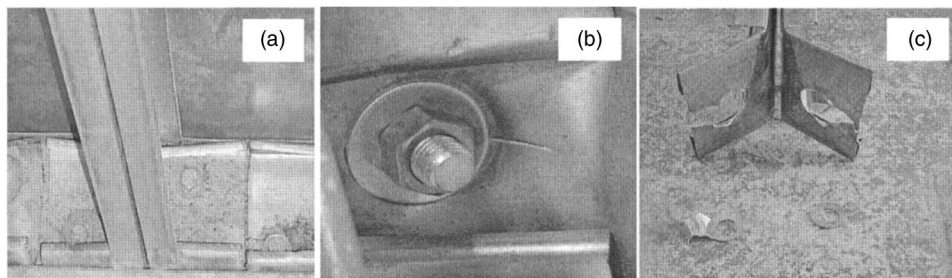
Preliminary connection designs: (a) connection detail using clipped flanges and bent webs; (b) crack propagation; and (c) bearing failure
